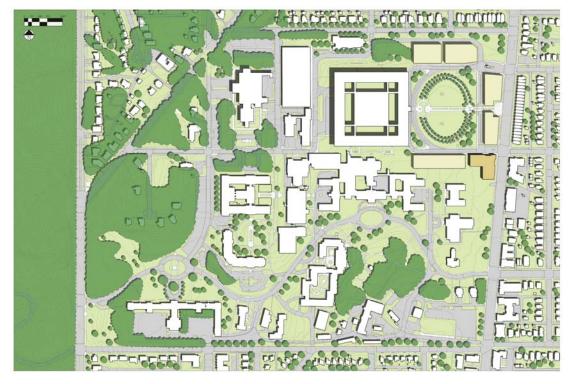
Site C2 plan. Proposed building in orange. Future development in yellow.
